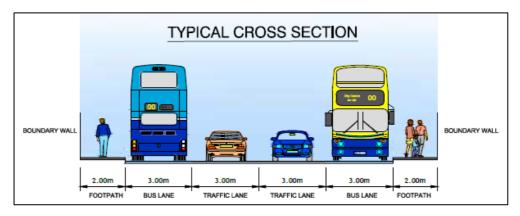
Typical Cross Section for EPR at Clanbrassil Street Upper
